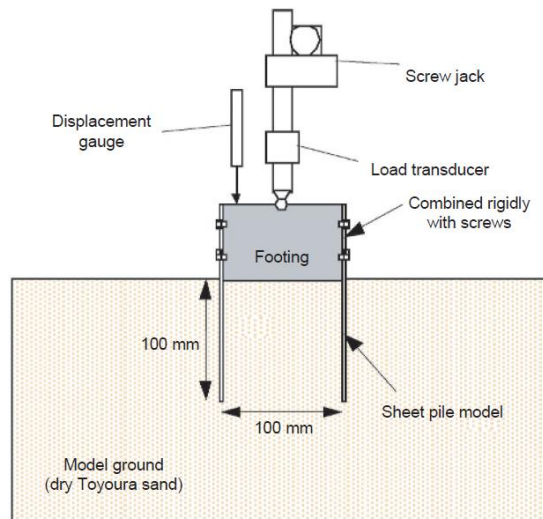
Axial loading test of the shallow foundation enclosed by sheet piles (Nishioka et al., 2010)
